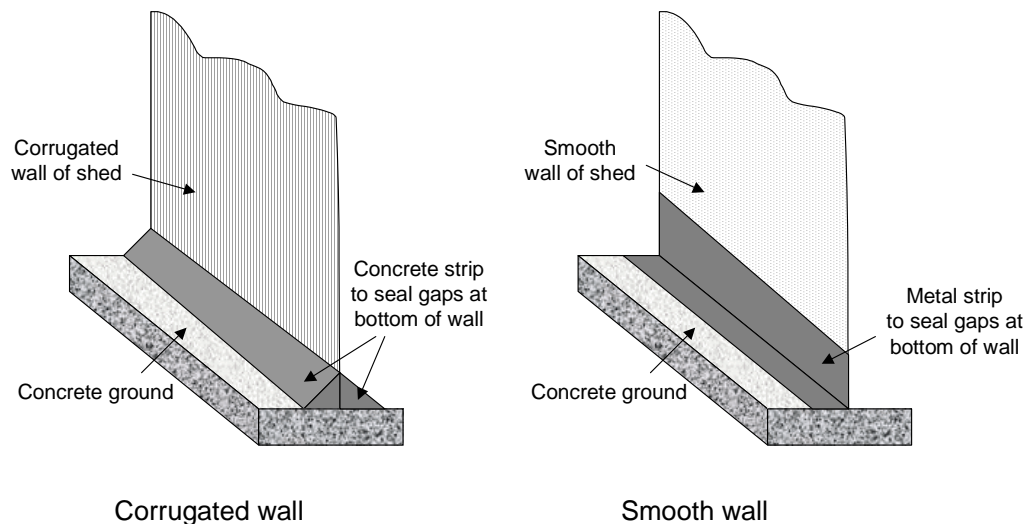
Examples of concrete strip and metal strips to seal the base of corrugated or smooth walls of sheds or warehouses to prevent access by mice.
